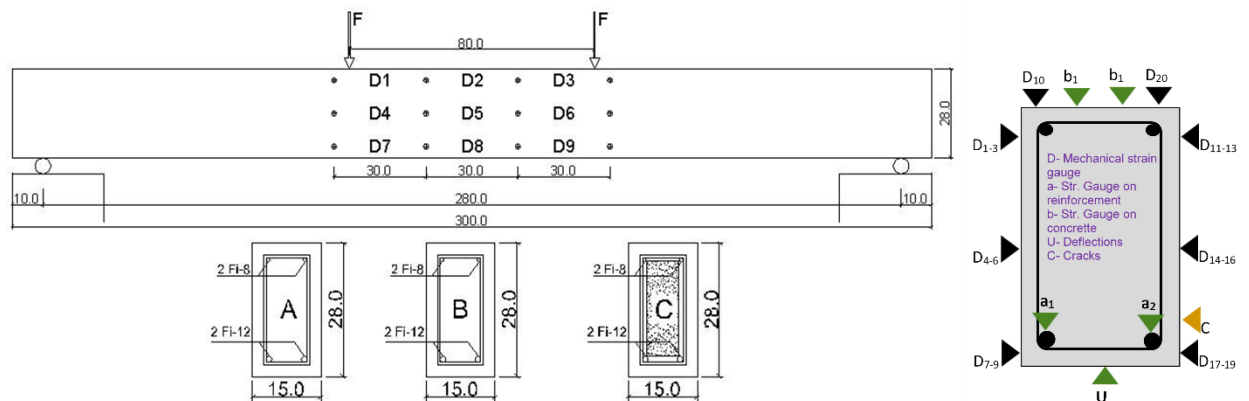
Beam, beam cross-sections and positioning of measuring points [11]
